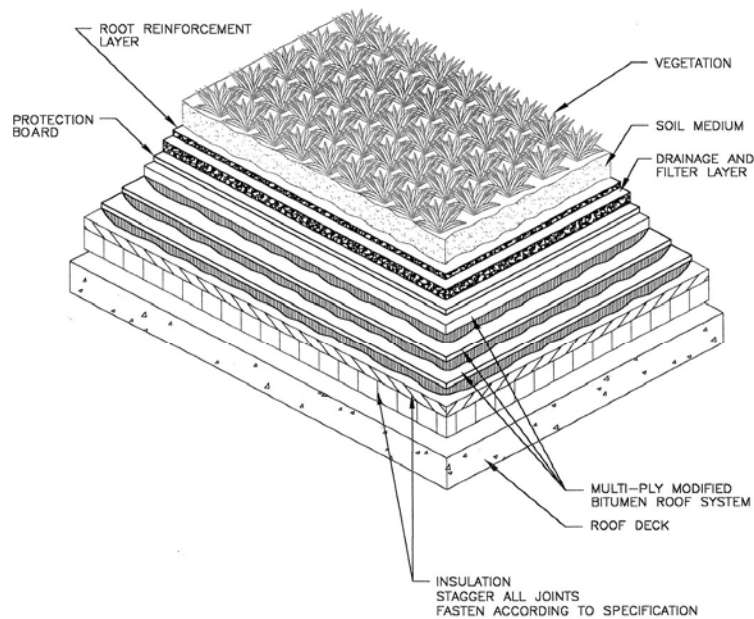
GREEN ROOF - TYPICAL SECTION
